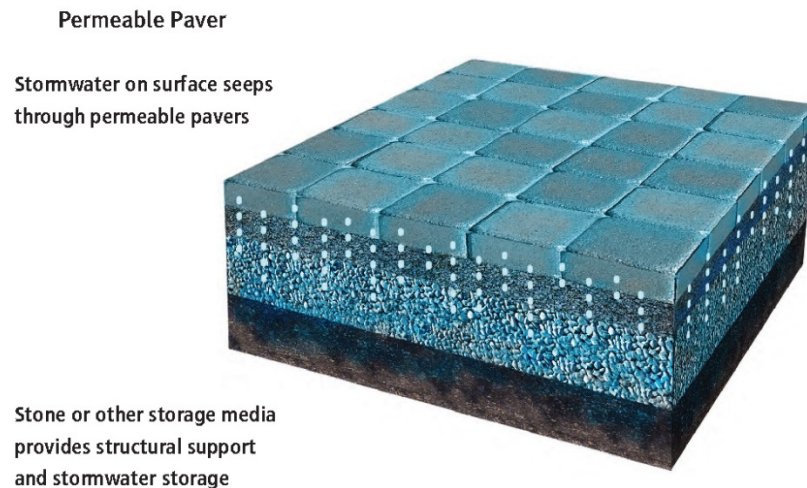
View of permeable pavement. (City of Philadelphia Green Streets Design Manual 2014)
